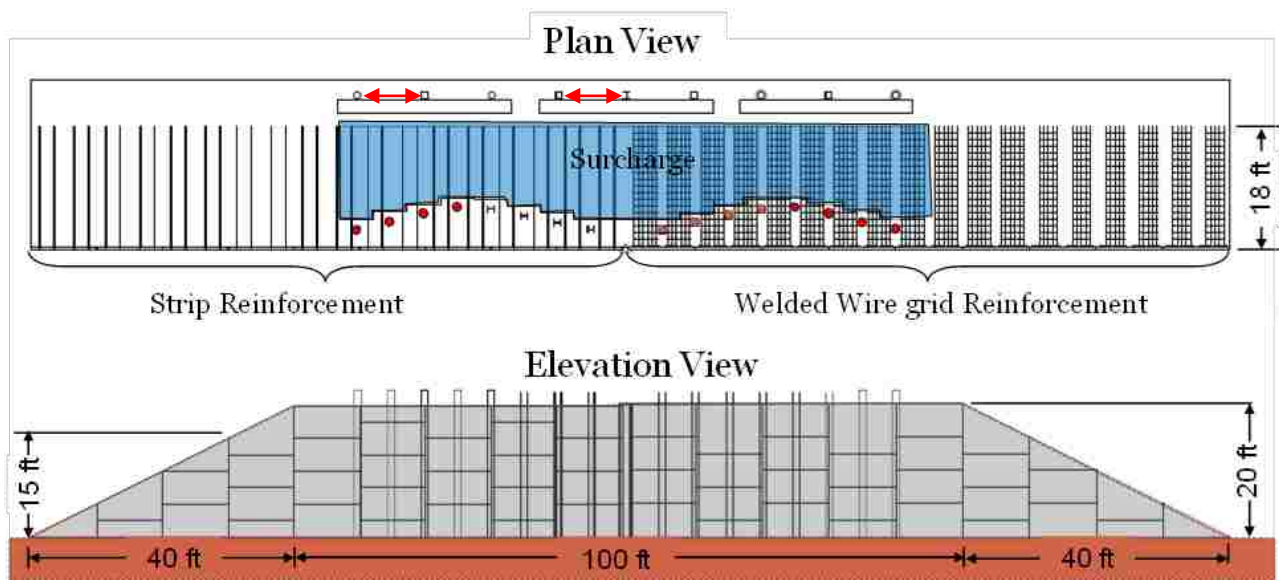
Schematic Plan & Elevation View Showing Layout of Test Piles & MSE Wall
